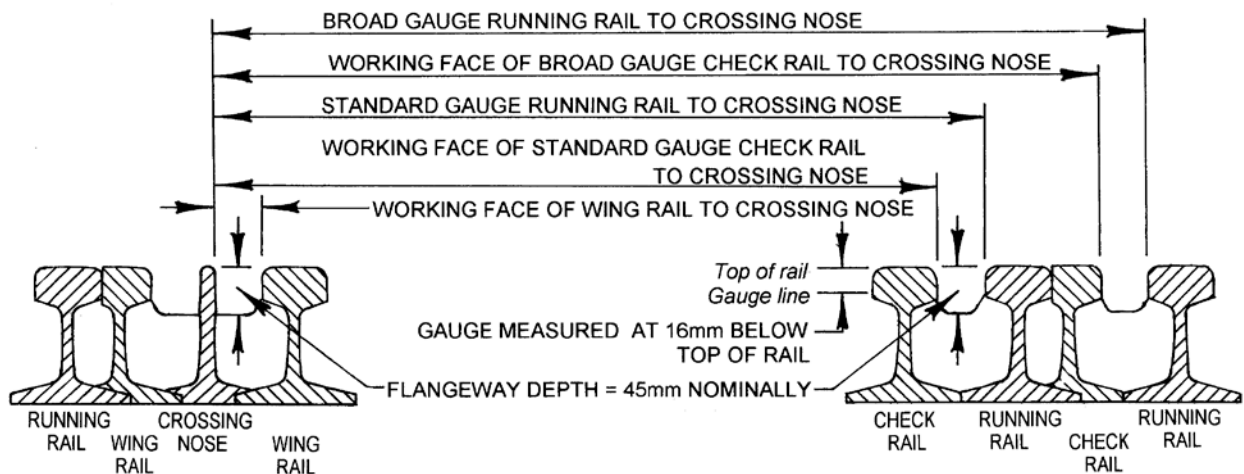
Typical part section through “V” crossings – shown for type 30
